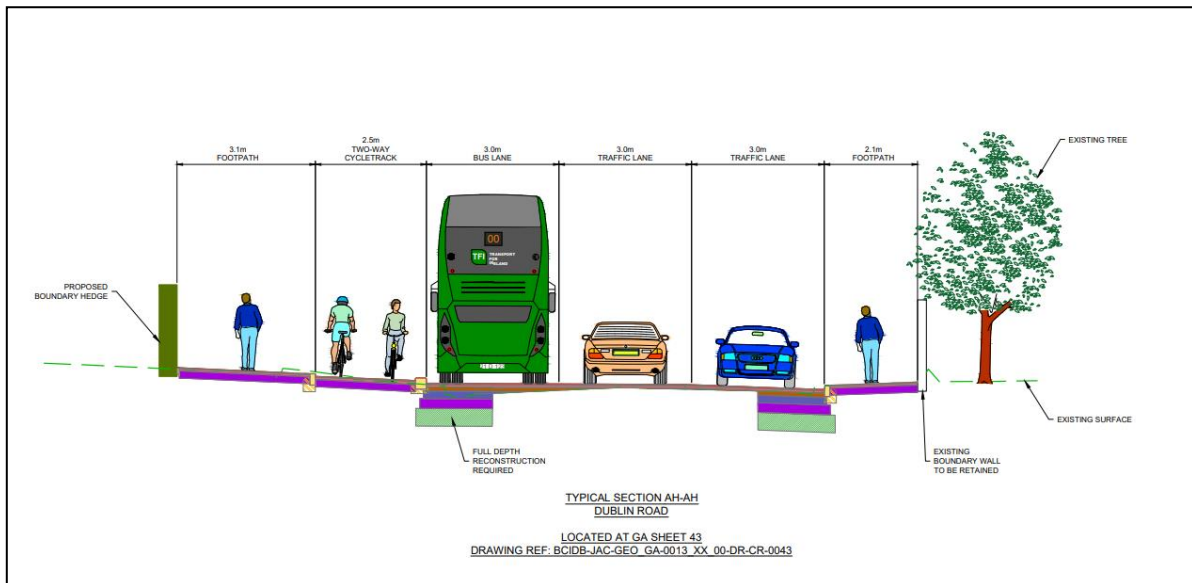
Extract from Typical Cross Section AH-AH on Dublin Road (Sheet 19)
